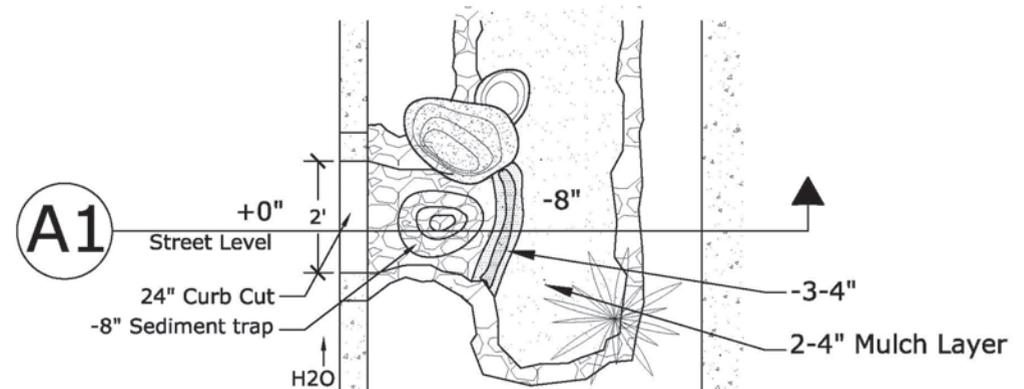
Plan view of sediment trap for curb cut with rock-lined basin.
